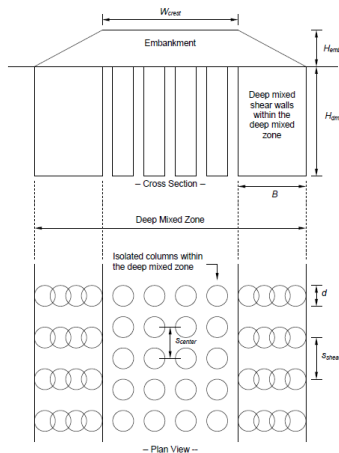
Illustration. Typical arrangement for deep-mixed zone beneath an embankment (Bruce et al., 2013).
